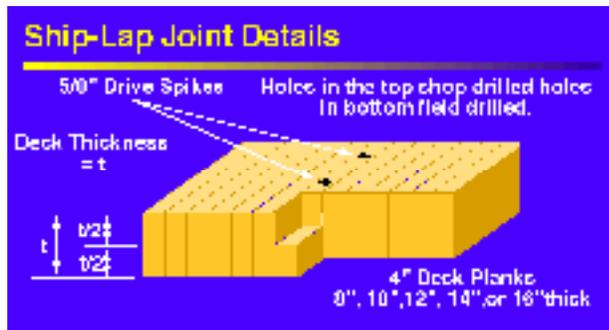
Shown are the details of the Ship-Lap Joint that is used to connect adjacent deck panels. The spacing of the vertical Drive Spikes is designed to create composite action of the two half-planks used in the Ship-Lap Joint. Single-Member bending resistance is achieved.
